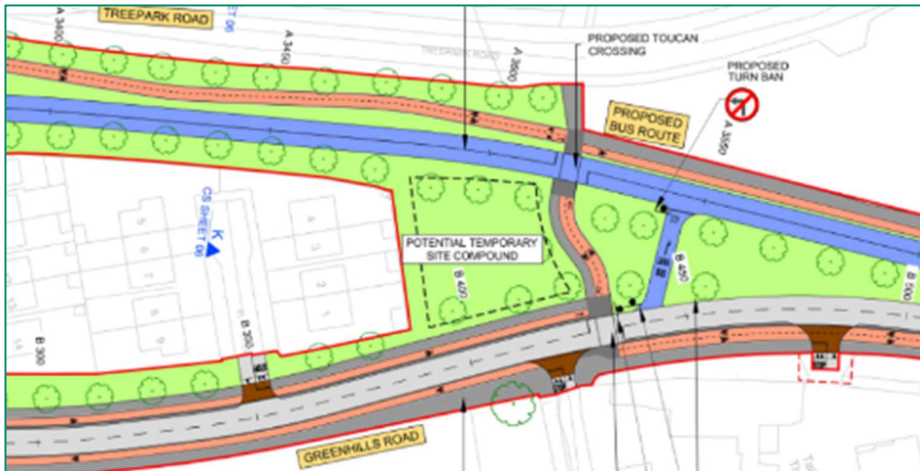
Extract of General Arrangement Drawings showing location of TC4
